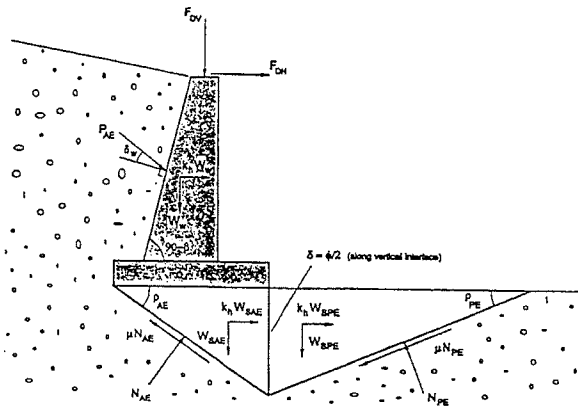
Forces Acting on a Gravity Wall Bridge Abutment During Seismic Loading.
